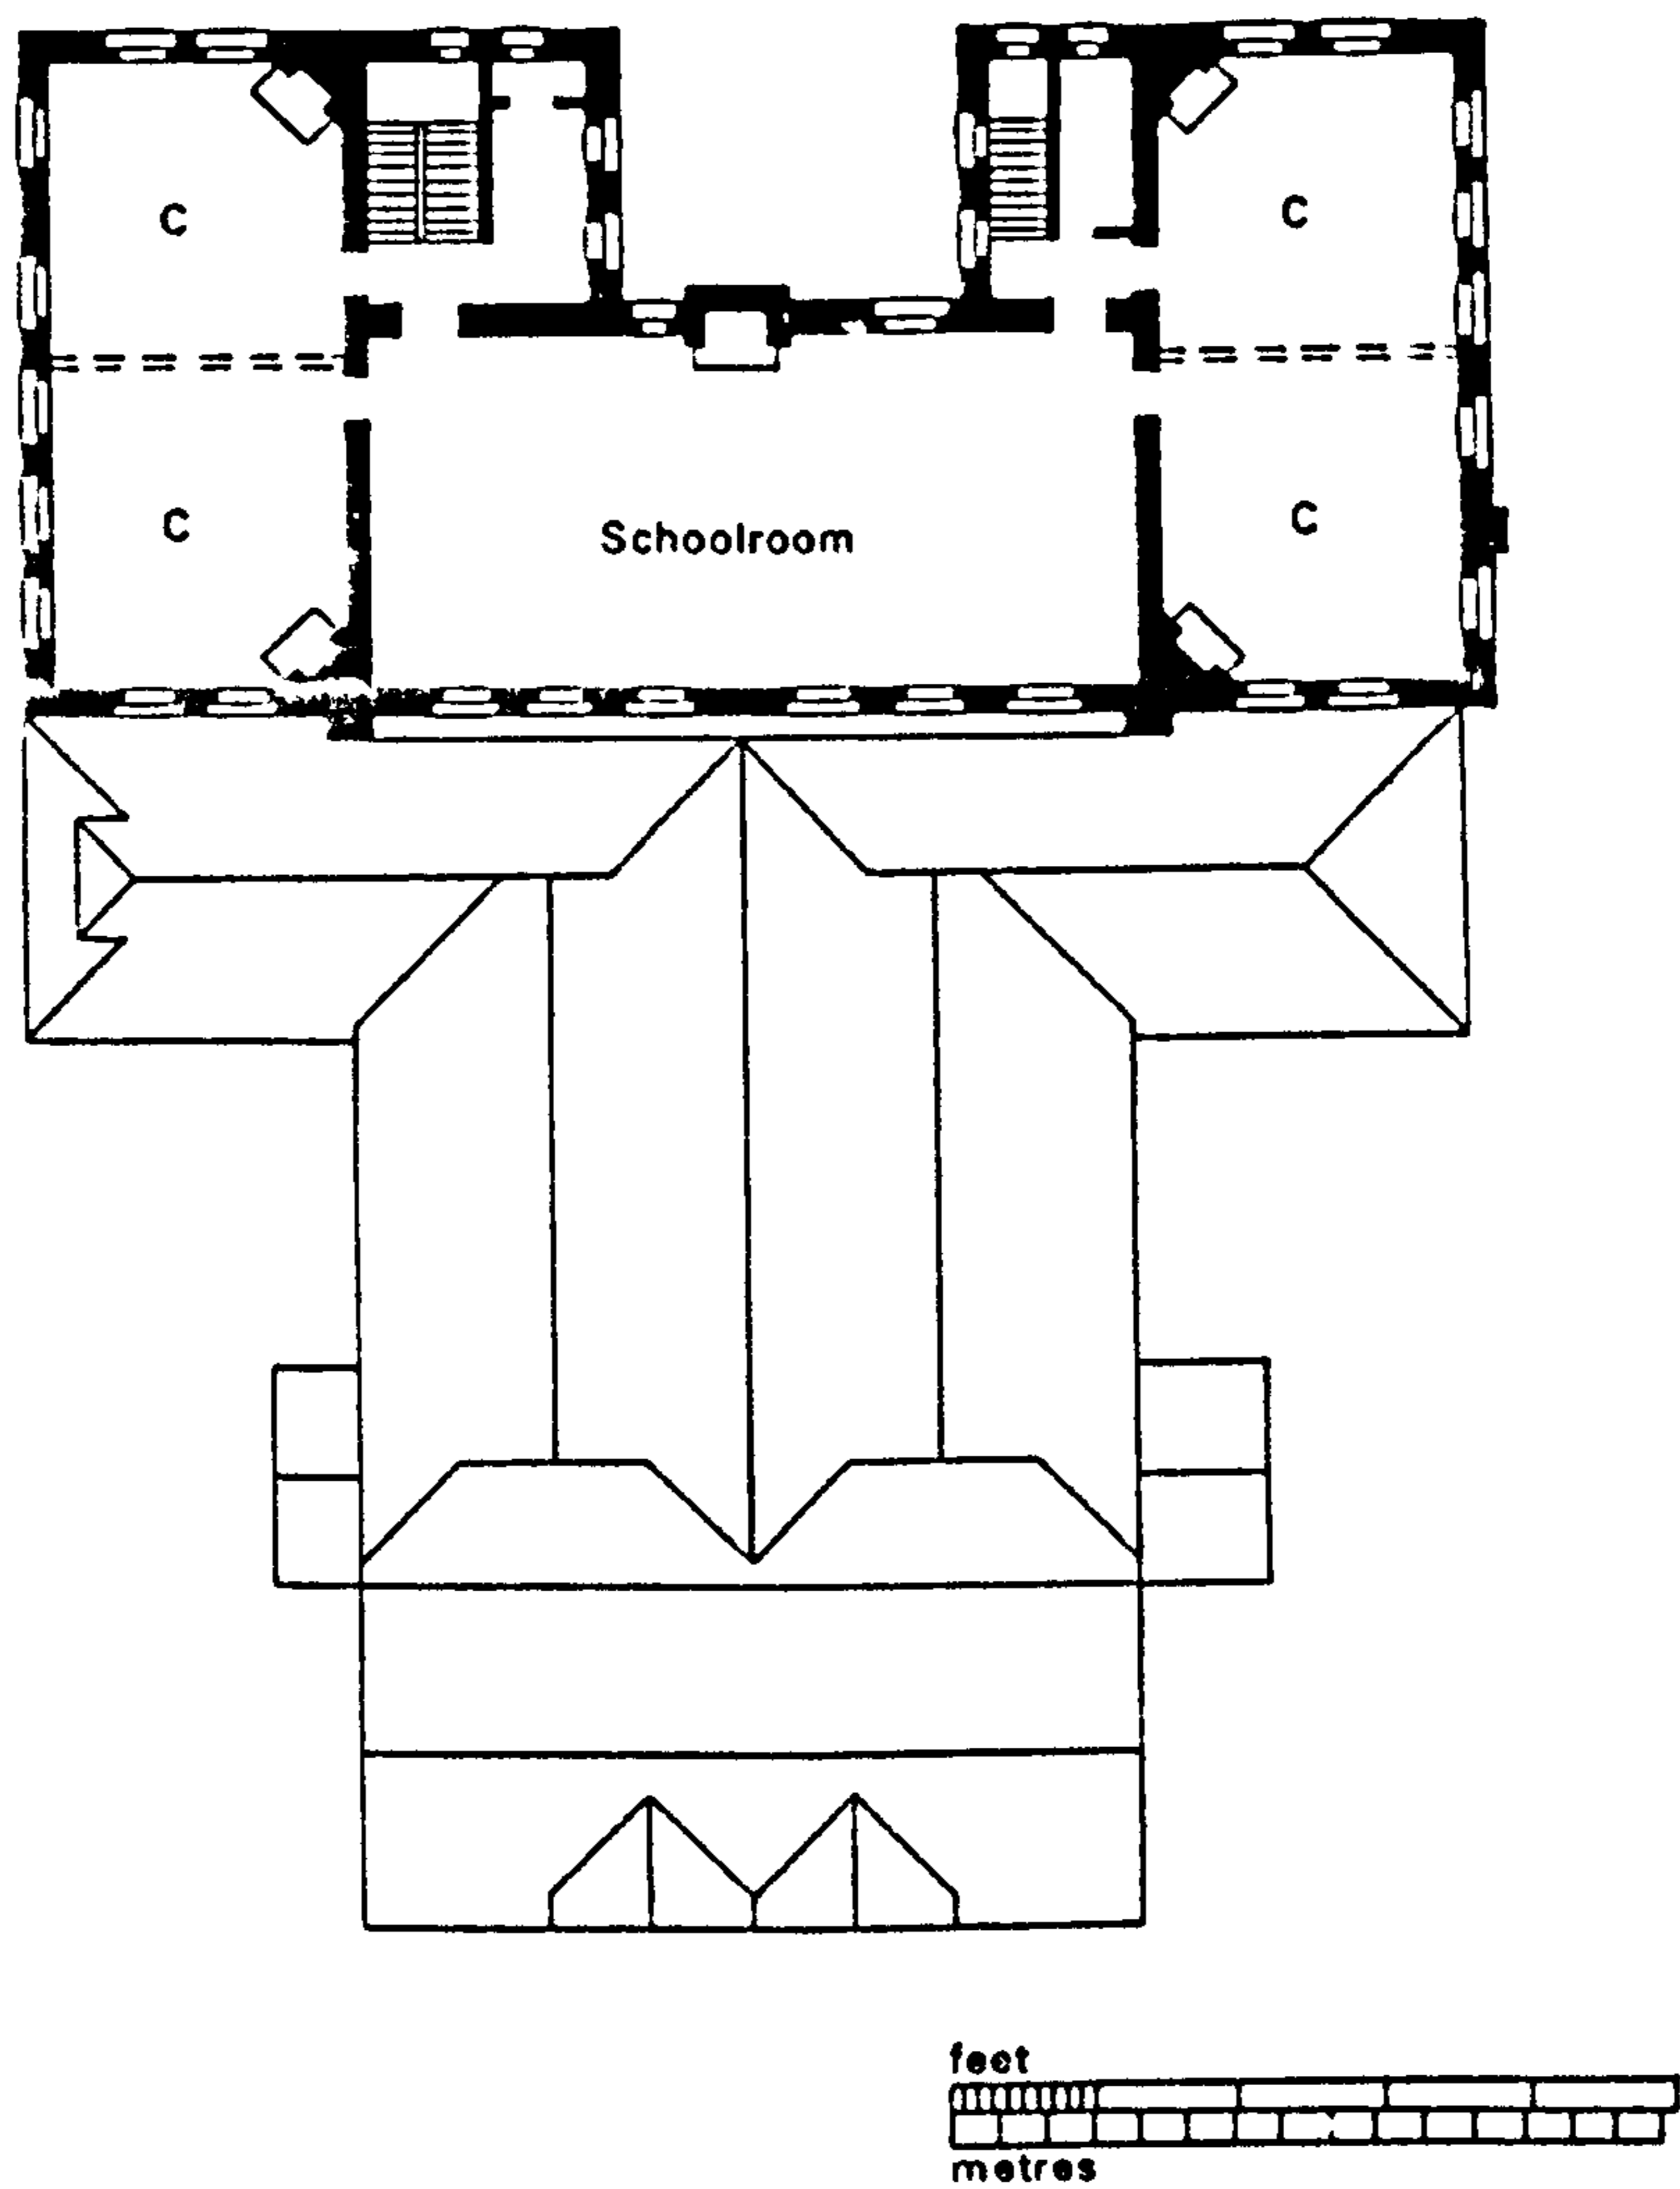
Worington Road Board School, Portobello; boys' department on first floor, 1874
